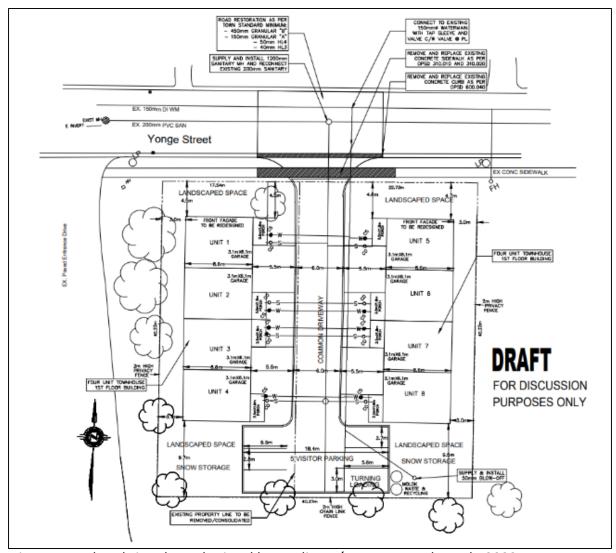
updated site plan submitted by Applicant/Agent December 5th, 2023
